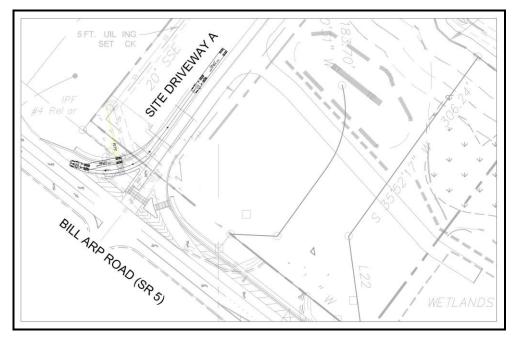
Bill Arp Road (SR 5) at Site Driveway A – Westbound Right (Exiting Truck)
